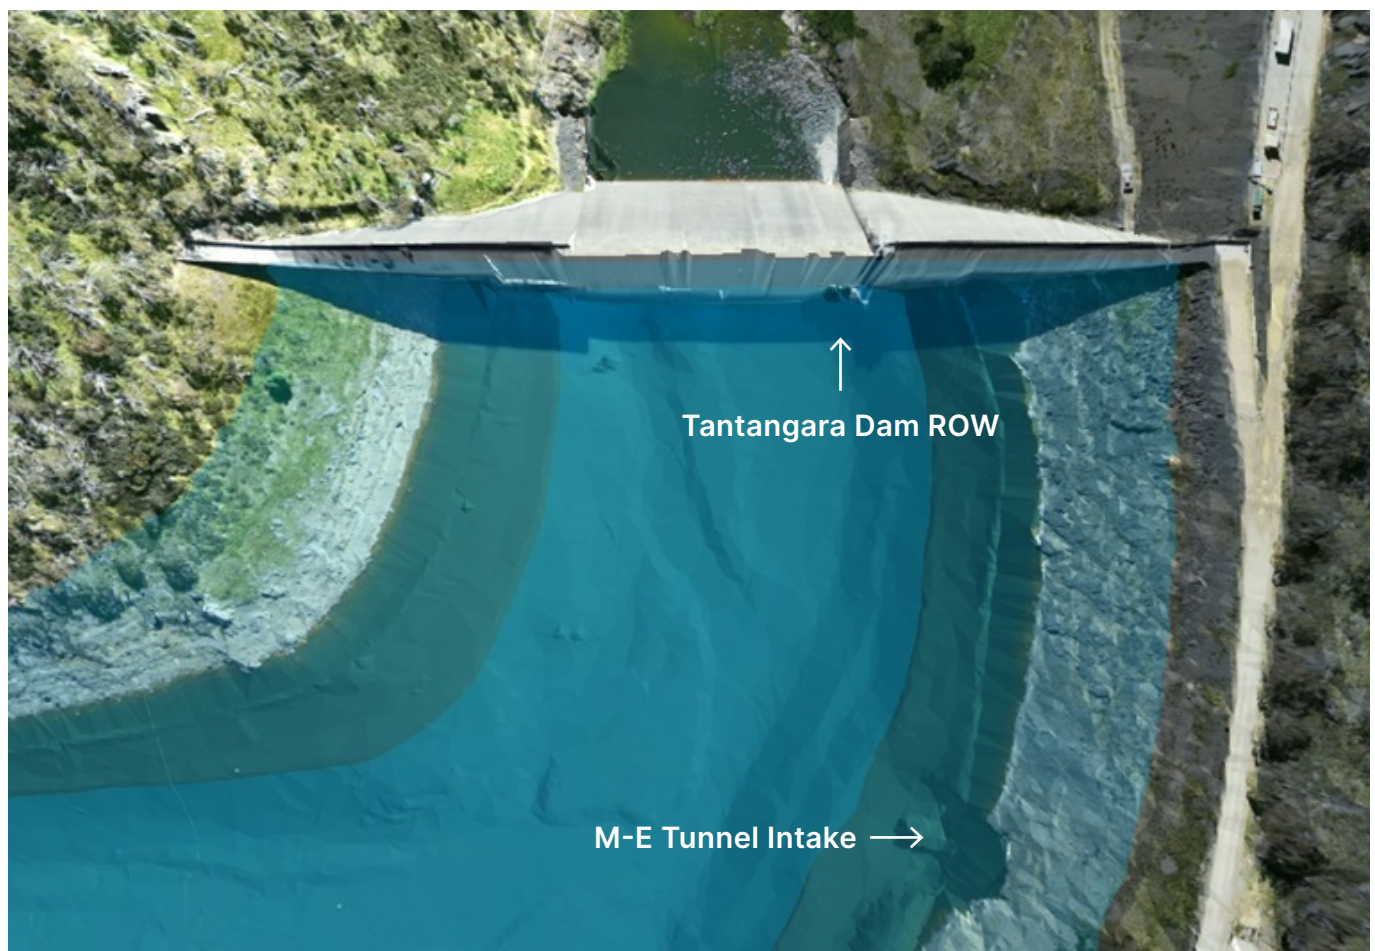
Tantangara Dam, Spillway and ROW and M-E Tunnel Intake
